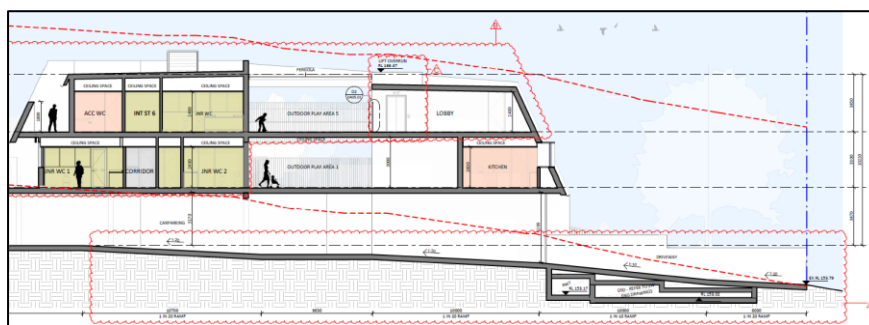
plan showing cross-section of the front building facing Charlton Avenue, Turrumurra
